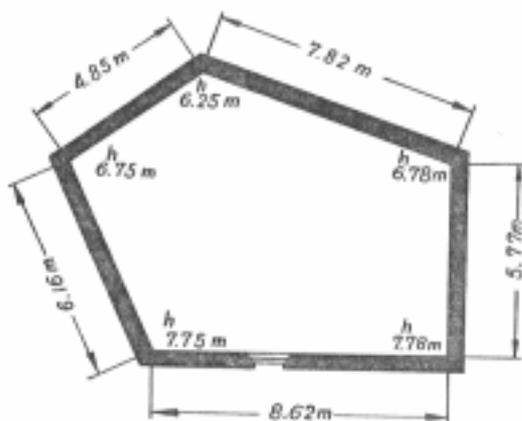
Plan of the reverberation chamber. h shows the height of each corner.
